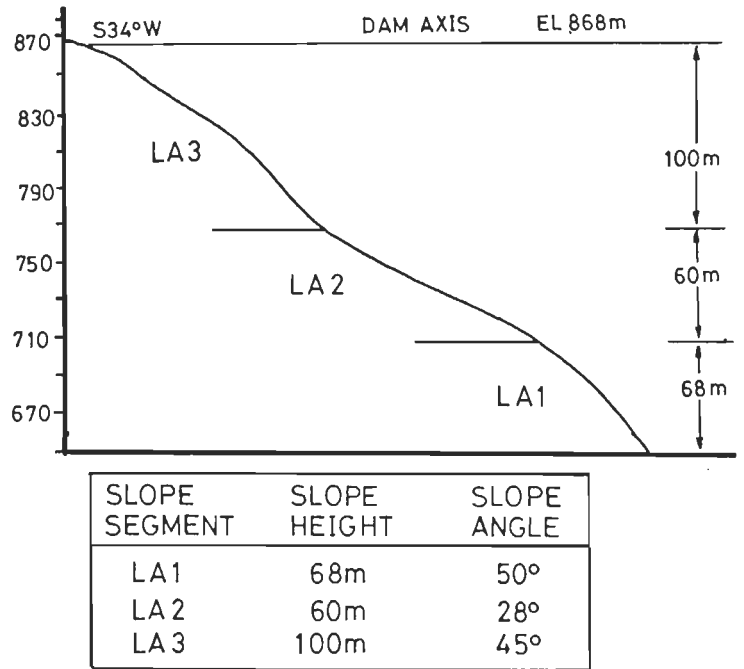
SLOPE GEOMETRY OF LEFT ABUTMENT.
